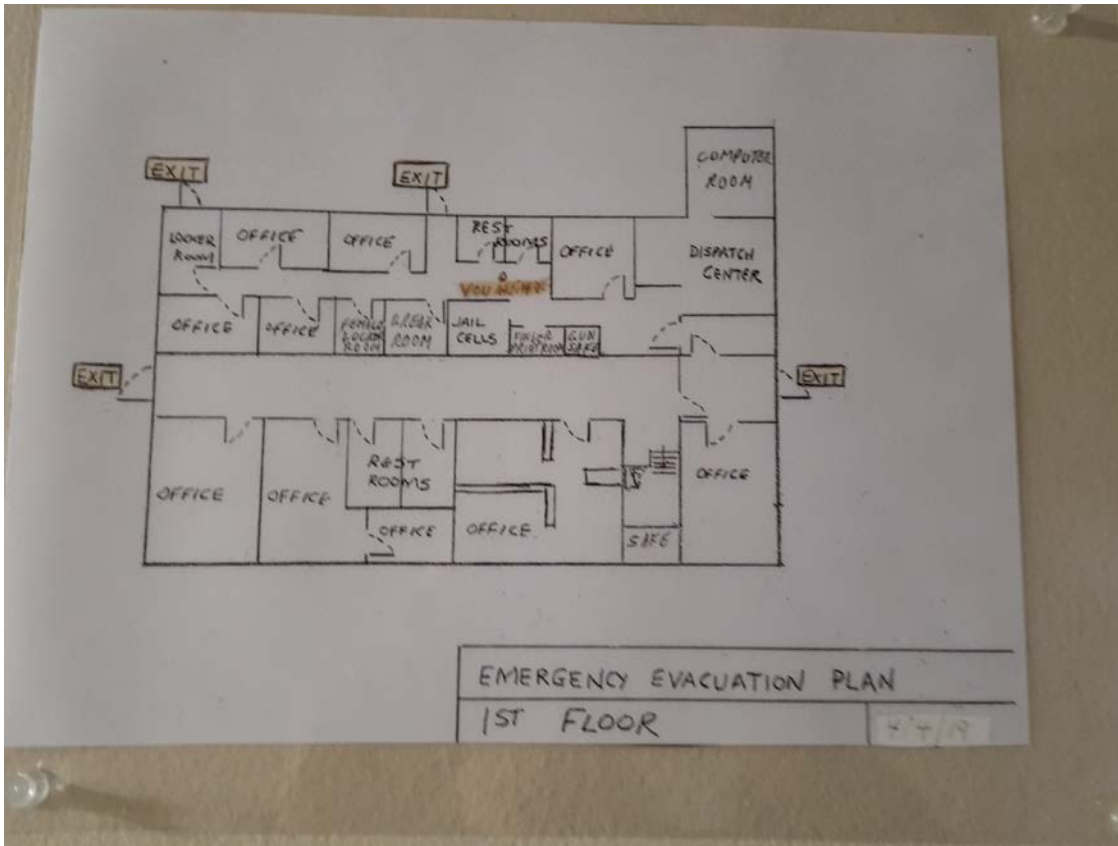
Existing First Floor Plan (Evacuation Plan).
